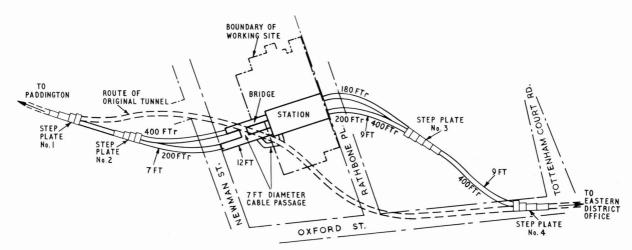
NEW WESTERN DISTRICT OFFICE POST OFFICE RAILWAY TUNNEL LAYOUT
